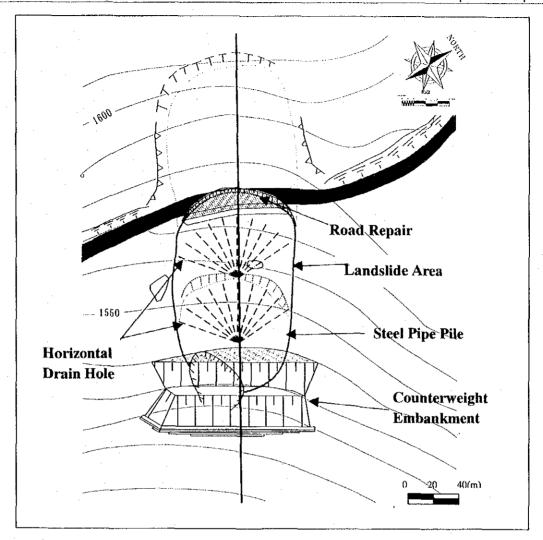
Plan (Horizontal Drainage and Counterweight Embankment)
